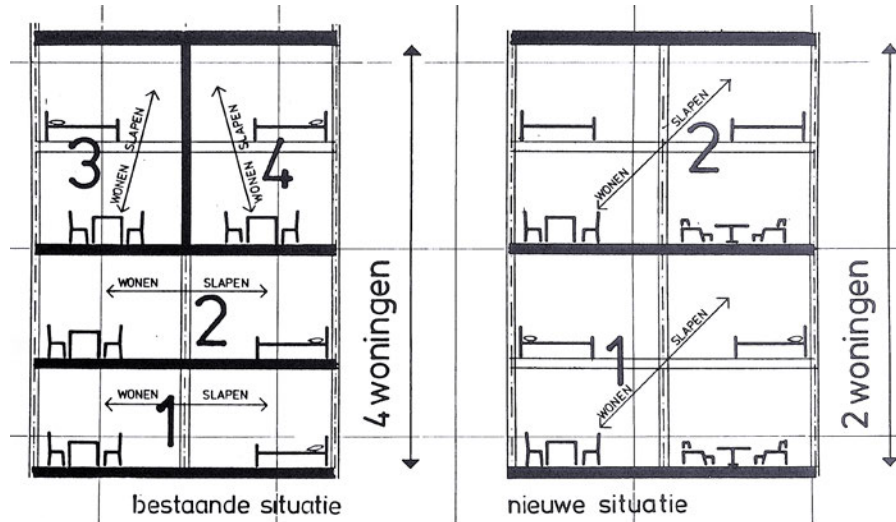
Typical section of the block showing the intimal and proposed spatial structure (Leo de Jonge architects; SAR: 396.03).
